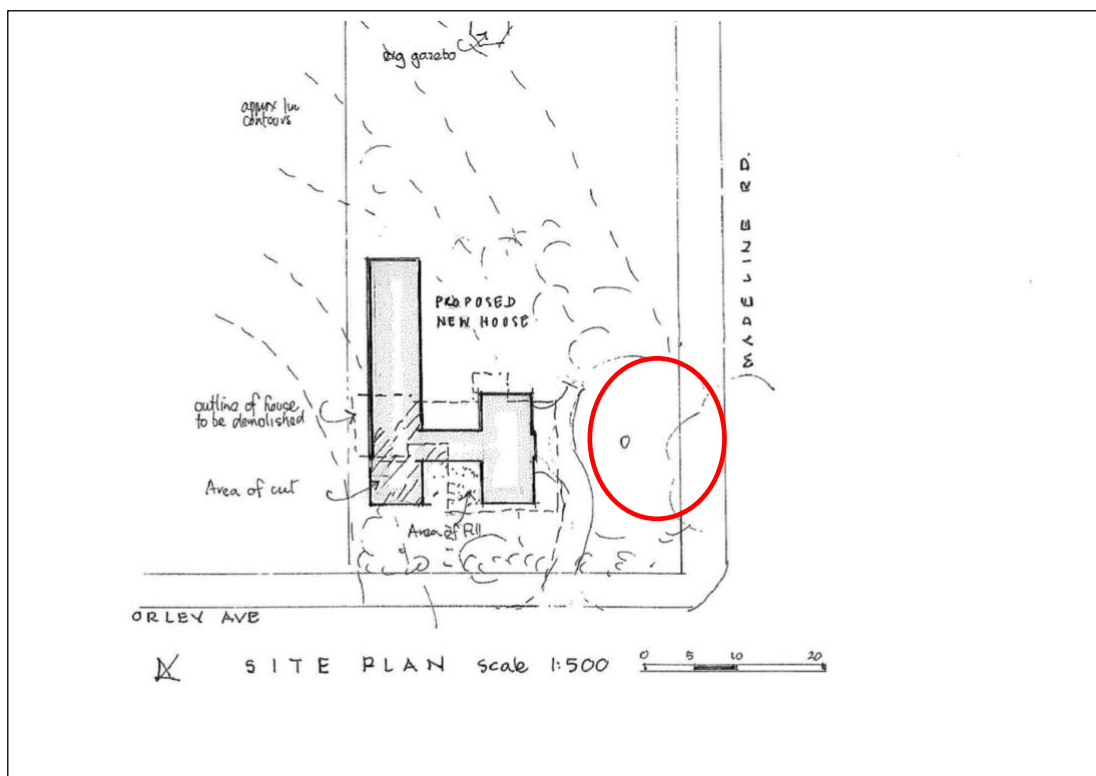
shows the new plans for proposed dwelling at 19 Orley Avenue, Stirling SA 5152 and the subject Beech Tree is highlighted in red.
